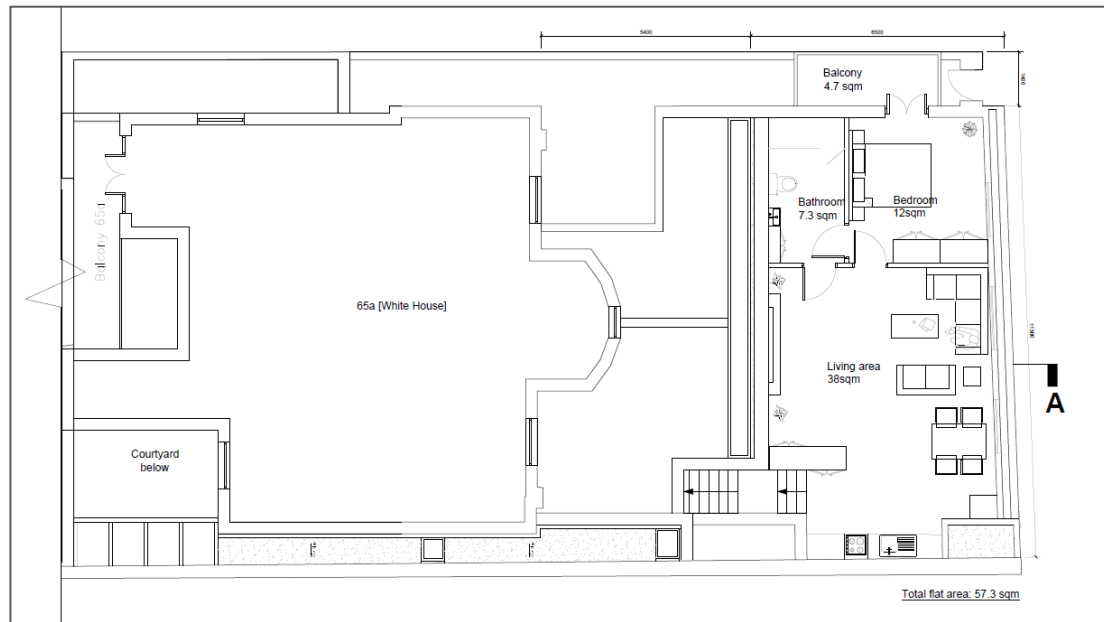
Proposed Plan of First Floor Extension (Contemporary Design Solutions, 2020)
